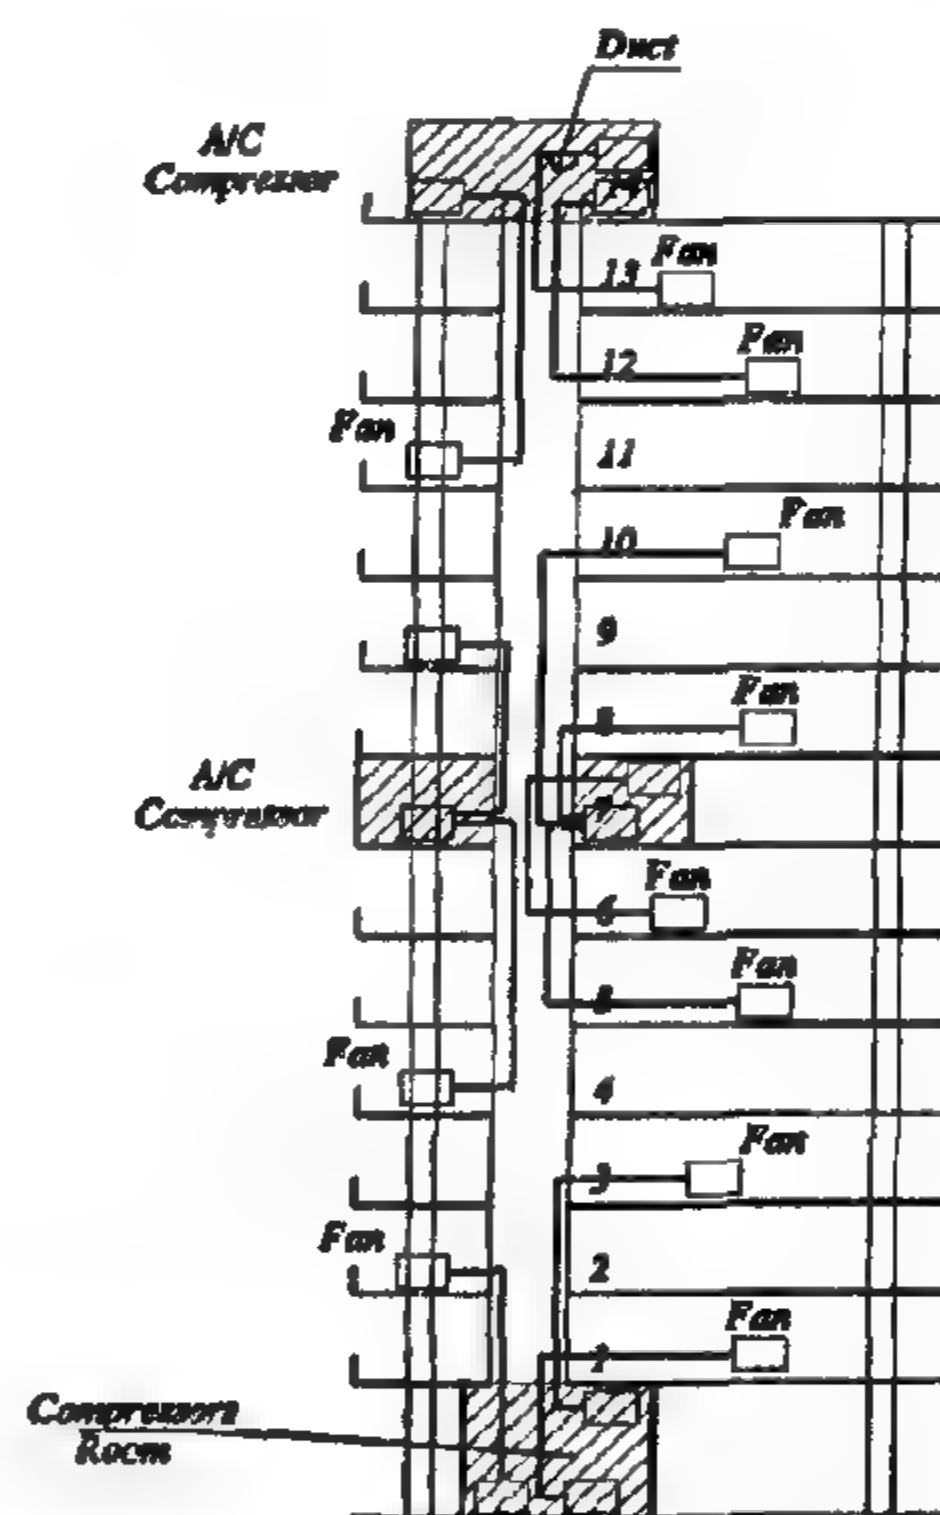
Mechanical spaces at each 7 floors for installation of A/Cs in high rise buildings.
